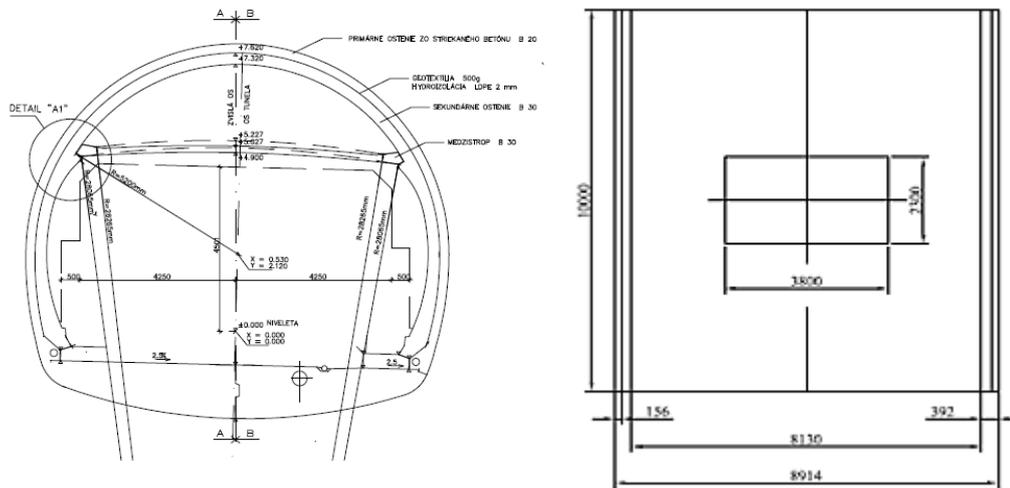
Cross section of tunnel and dimensions of intermediate ceiling board with opening for ventilation flaps
